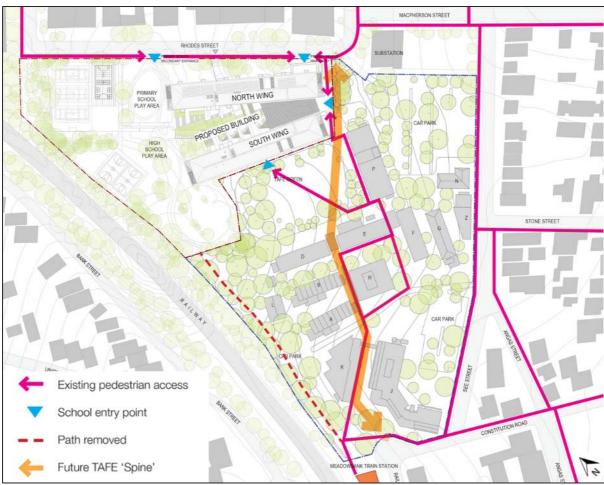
| Existing and potential future TAFE Campus pedestrian site link, surrounding pedestrian routes proposed and school entry points (Source: Applicant's RtS 2020)
